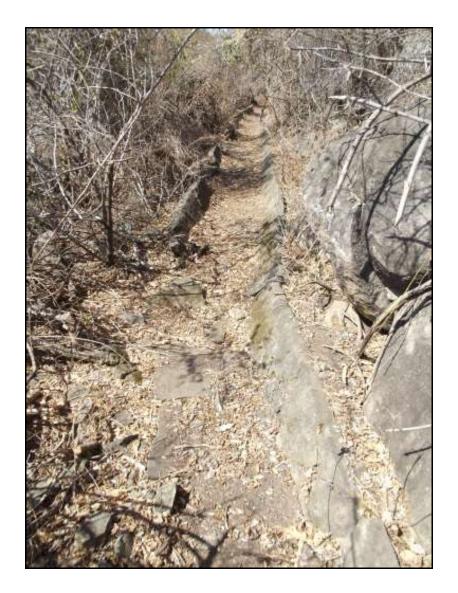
Site KH 12. Another section where the furrow is damaged.
